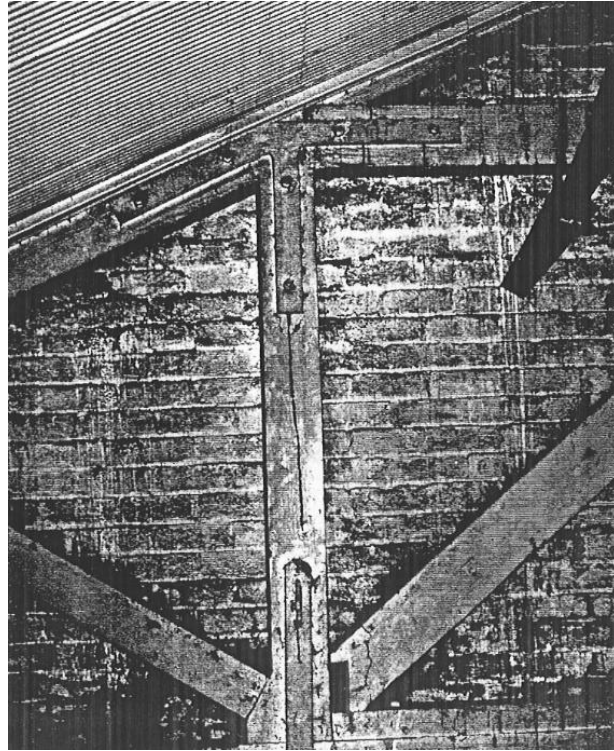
Detail of roof structure & corrugated metal interior lining, 1991
